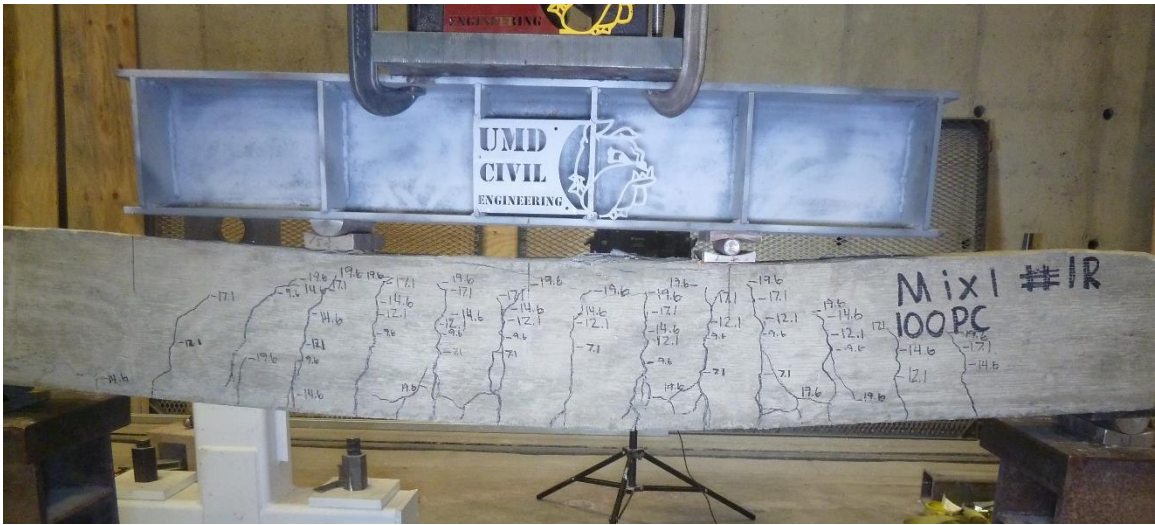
Mixture 1 (100PC) beam #1R: concrete beam after testing.
